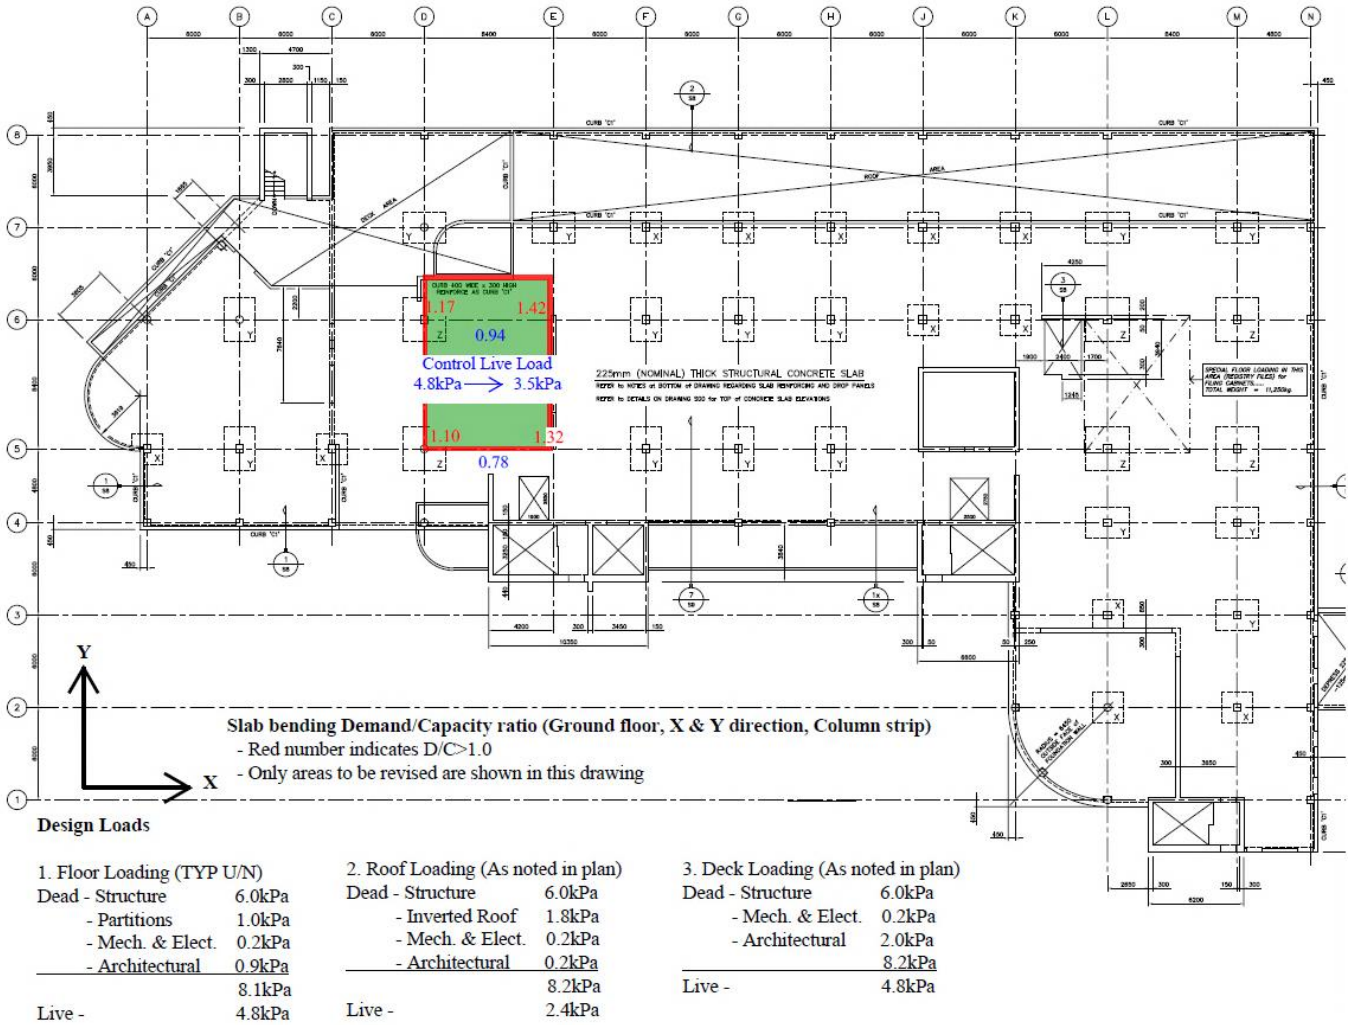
Slab bending D/C ratios (Ground floor, X and Y directions, Column strip)
